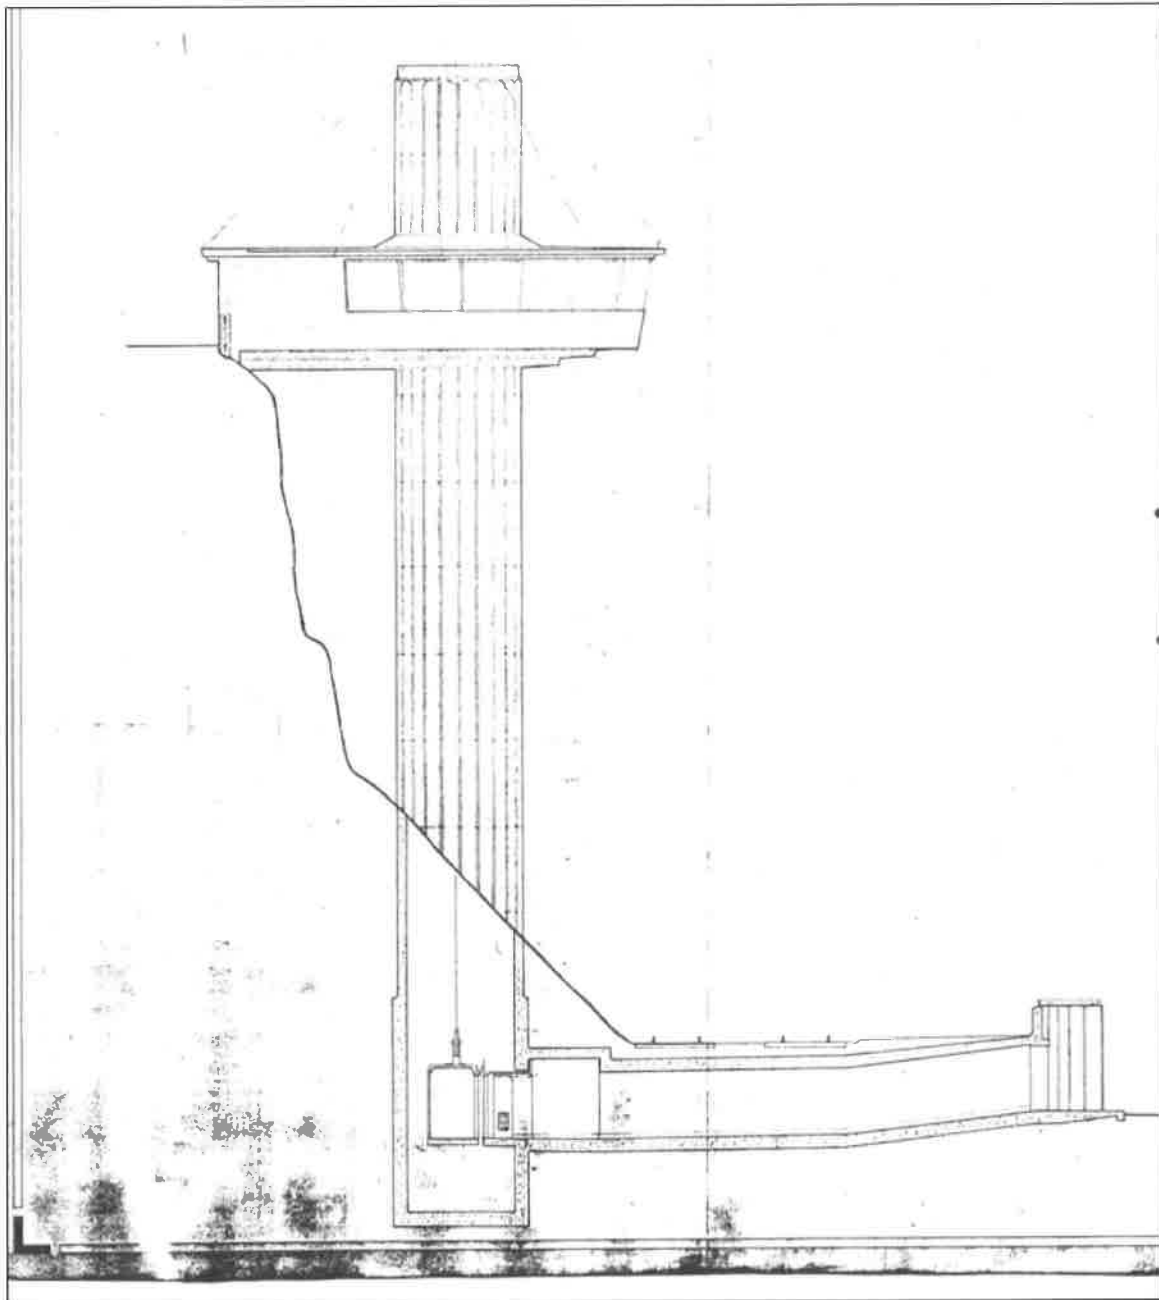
Elevation Drawing of Municipal Elevator, with Elevator Car, Foundation and Entrance Tunnel. Drawn by Gordon E. Trapp, ca. 1955.
